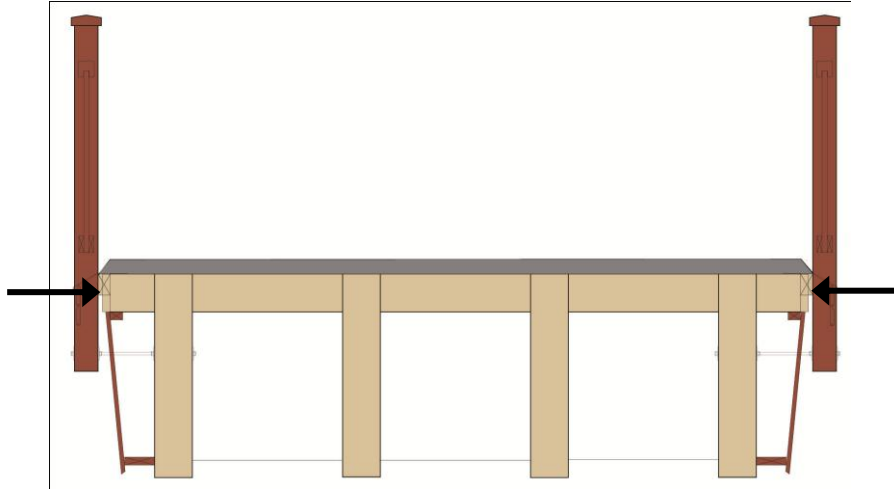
Cross-section of a T-beam bridge with placement of pre-stressing force indicated, Träbroguiden (2010).
